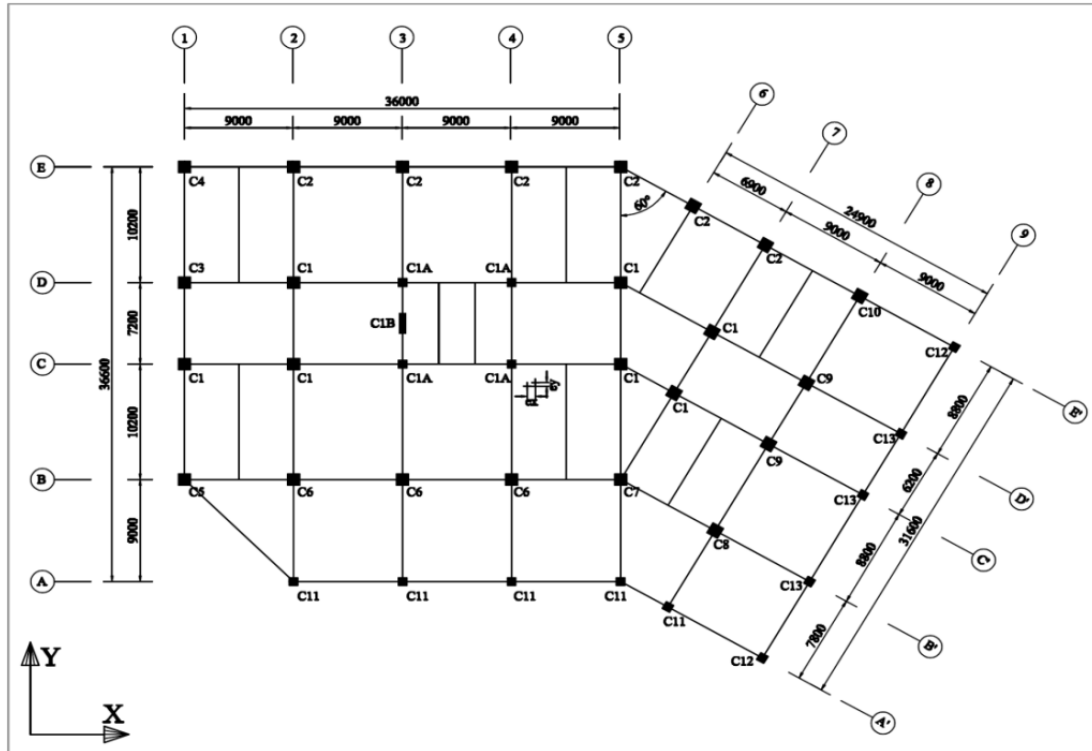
Plan layout of the columns for the first 3 storeys of irregular 20-storey, multi-bay RC building (all dimensions are in millimetres).
